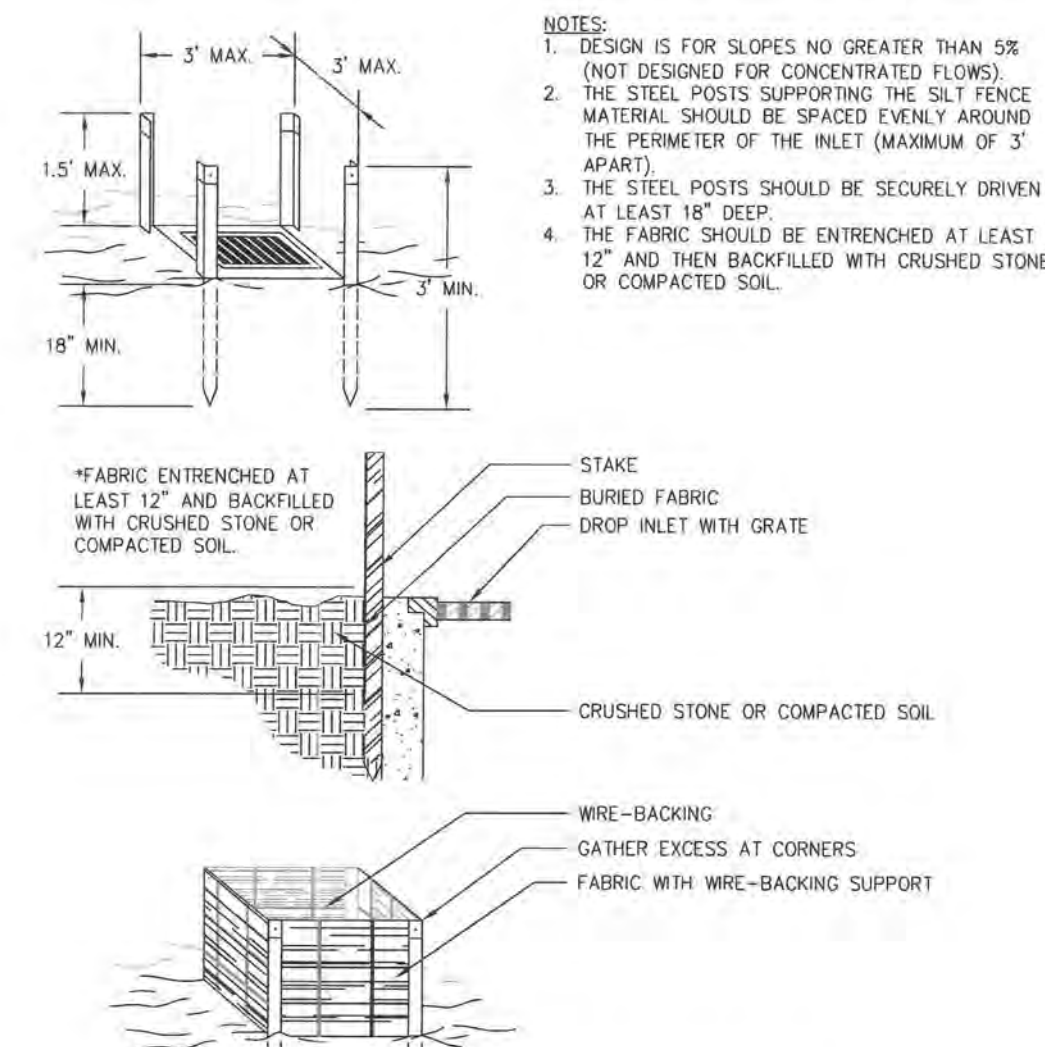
Fabric and Supporting Frame for Inlet Protection
